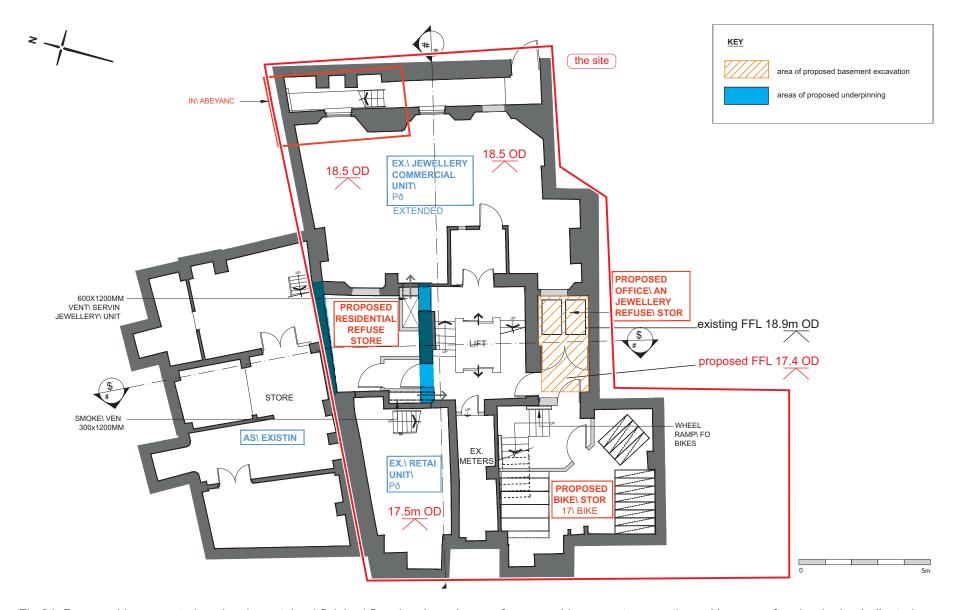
Proposed basement plan showing retained finished floor levels and area of proposed basement excavation; with areas of underpinning indicated (Smith Caradoc-Hodgkins Architects, project no. 723 DRWG no. A101. Rev. B dated 13-05-2016)
